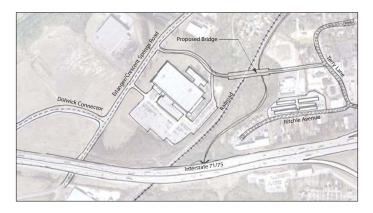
Possible bridge over railroad and Dry Creek connecting Sub Area A to Erlanger/Crescent Springs Road
